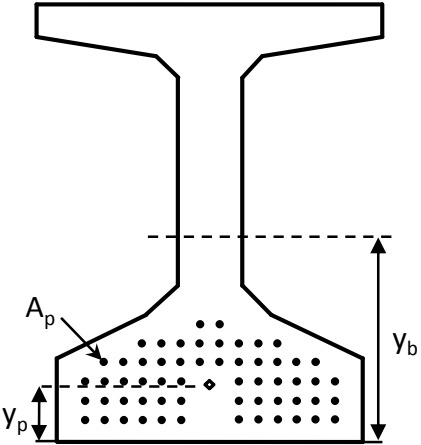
Prestressing strand layout for all series (all dimensions are offsets from bottom of girder assuming a 2-inch grid)
